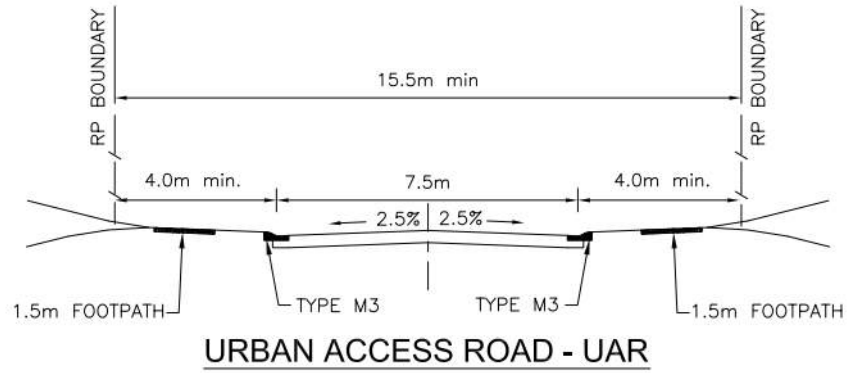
Urban Access Street Cross Section (LLC 8-00373)
